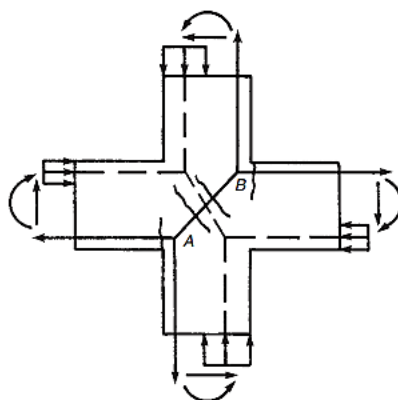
Interior Beam-Column joint internal forces and Crack pattern [20]
